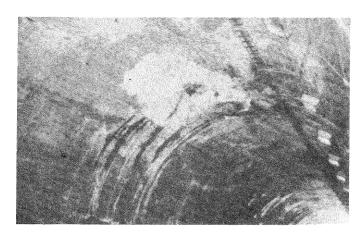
FAILURE OF LINING CONCRETE near Arch Crown at Tomoro Tunnel (Higashi-Isu Toll Road).
